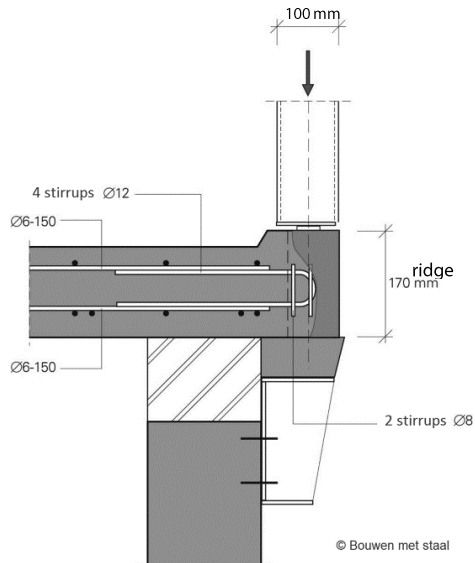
Detail of solution with steel support ground floor (adapted from [11,12] with permission)
